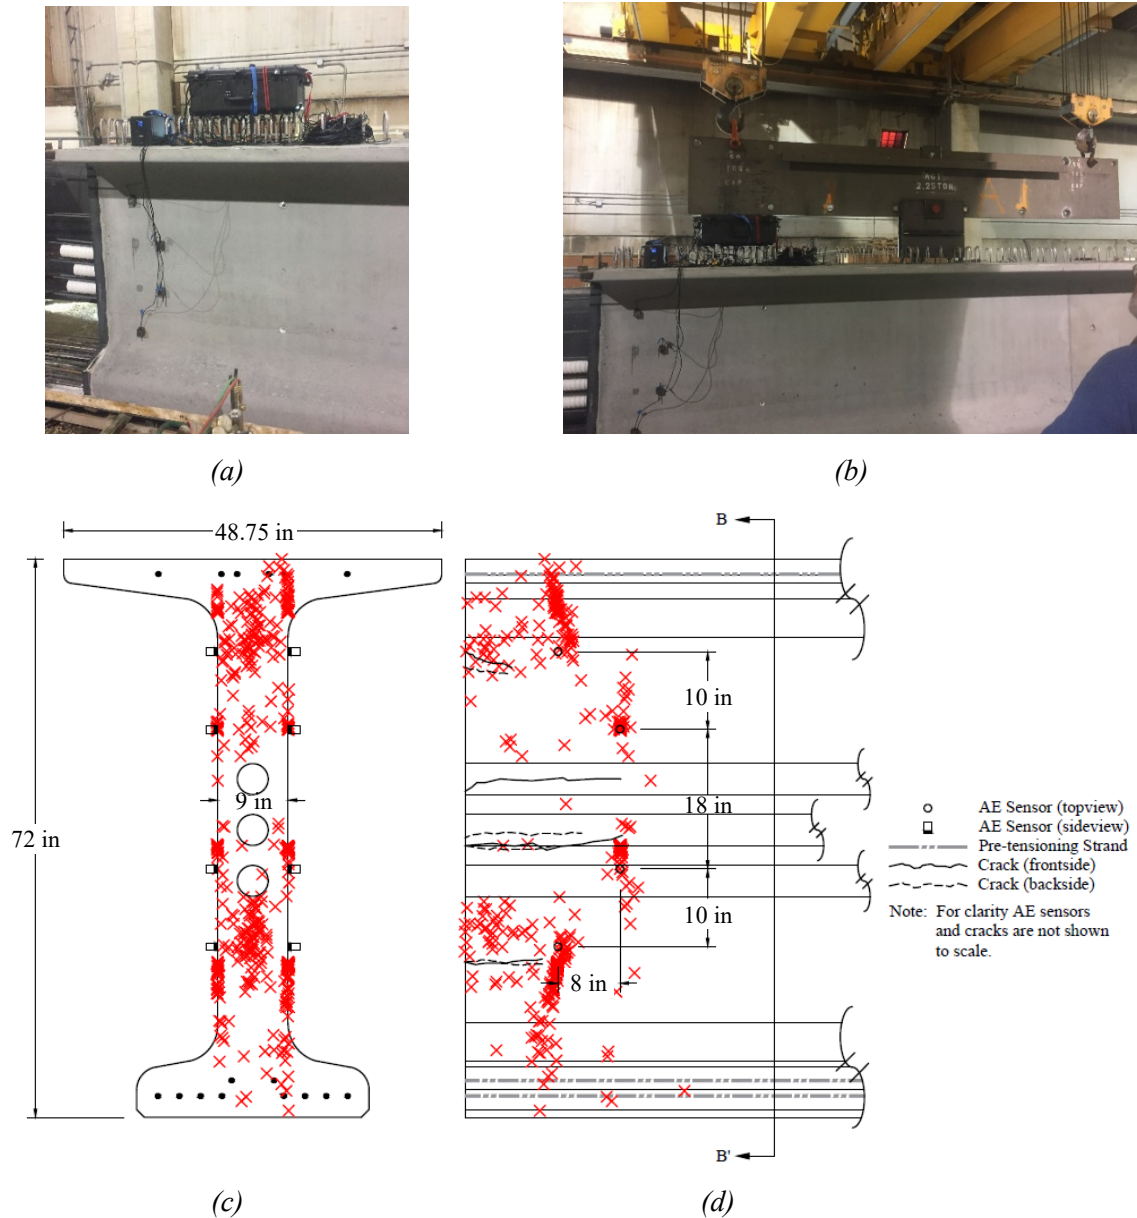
Bulb Tee beam 3D sensor array field testing of detensioning with 466 recorded events (a) AE equipment setup, (b) gantry crane connection to Bulb Tee, (c) section view of Bulb Tee beam, and (d) profile view of Bulb Tee beam
